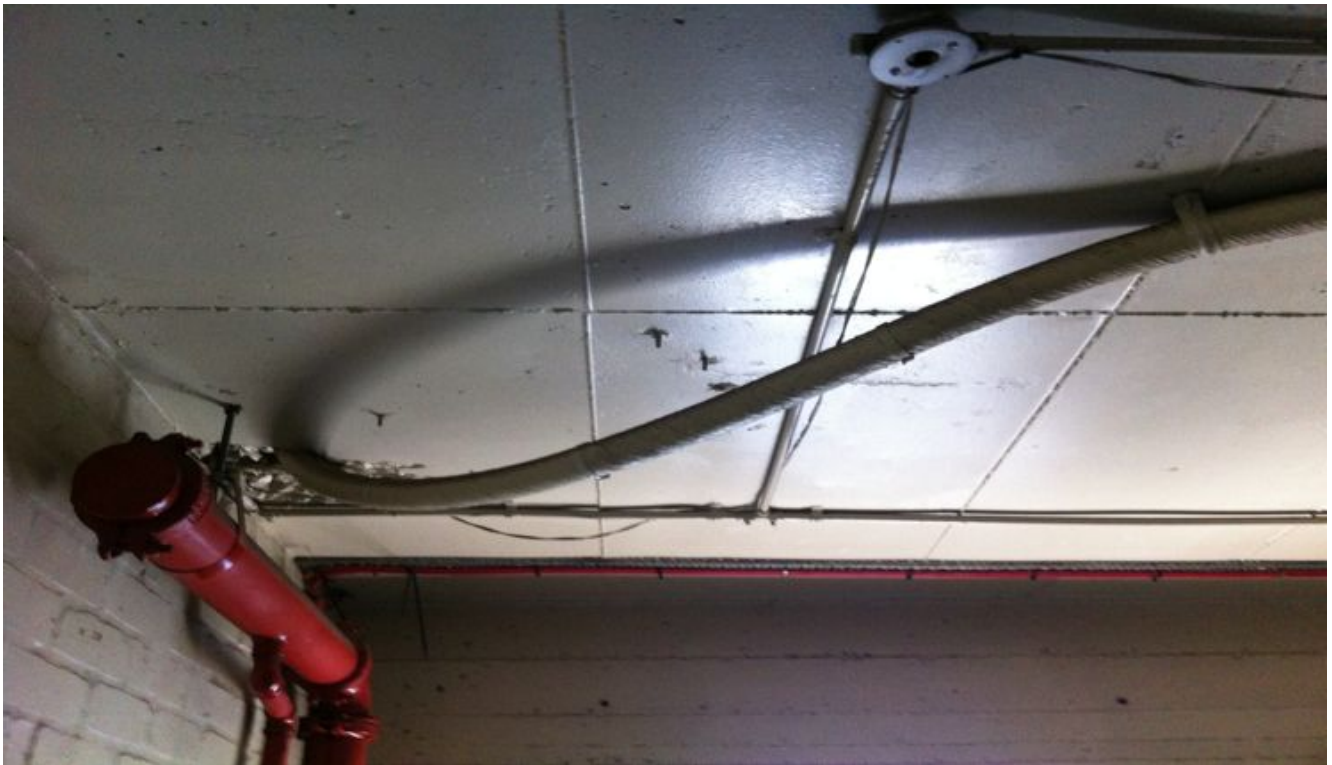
Bituminous rope insulation containing asbestos on the main electrical cable on Level 16 of the South Wing – Menzies Hotel.
